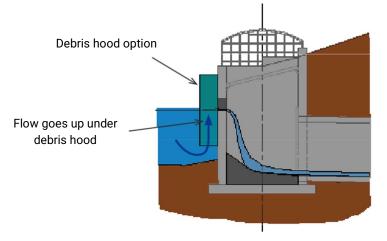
A typical design of a subsurface diversionary inlet structure (Figure 9.04-6-1 ISWMM)
